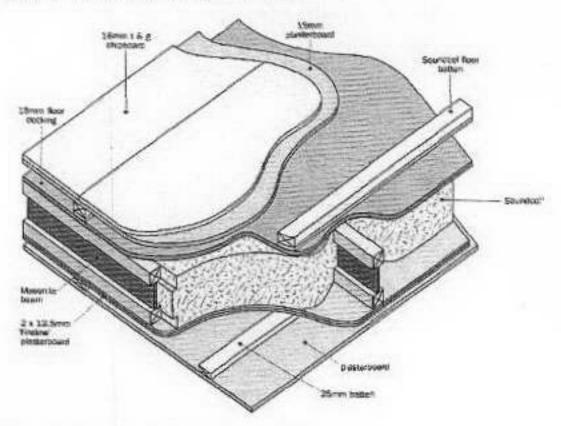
Cross section through a typical TRADIS SOUNCDCEL floor cassette
